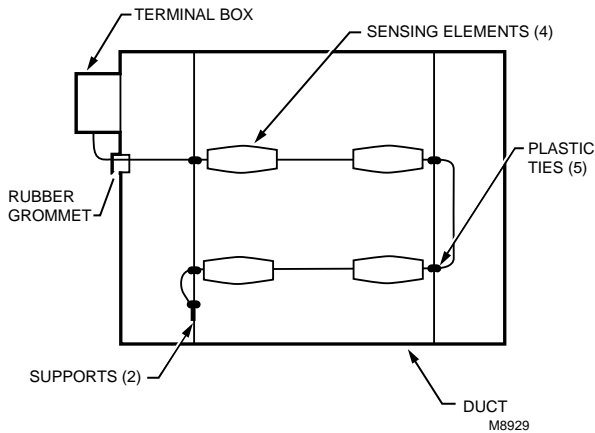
Duct cross section showing method of installing C7031J Averaging Electronic Sensor.
